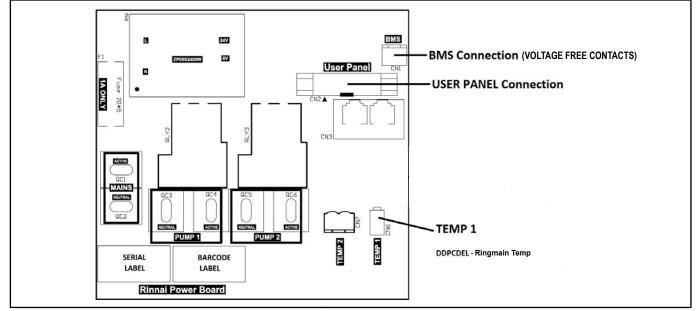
DDPCDEL Internal PCB showing Thermistor Connections
